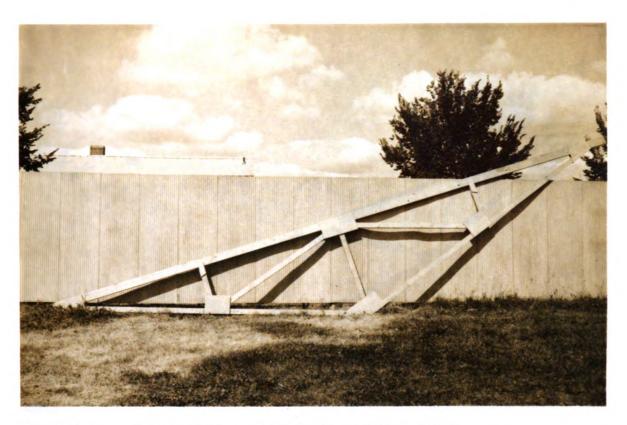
TRUSS "A" - GLUE-NAIL CONSTRUCTION
